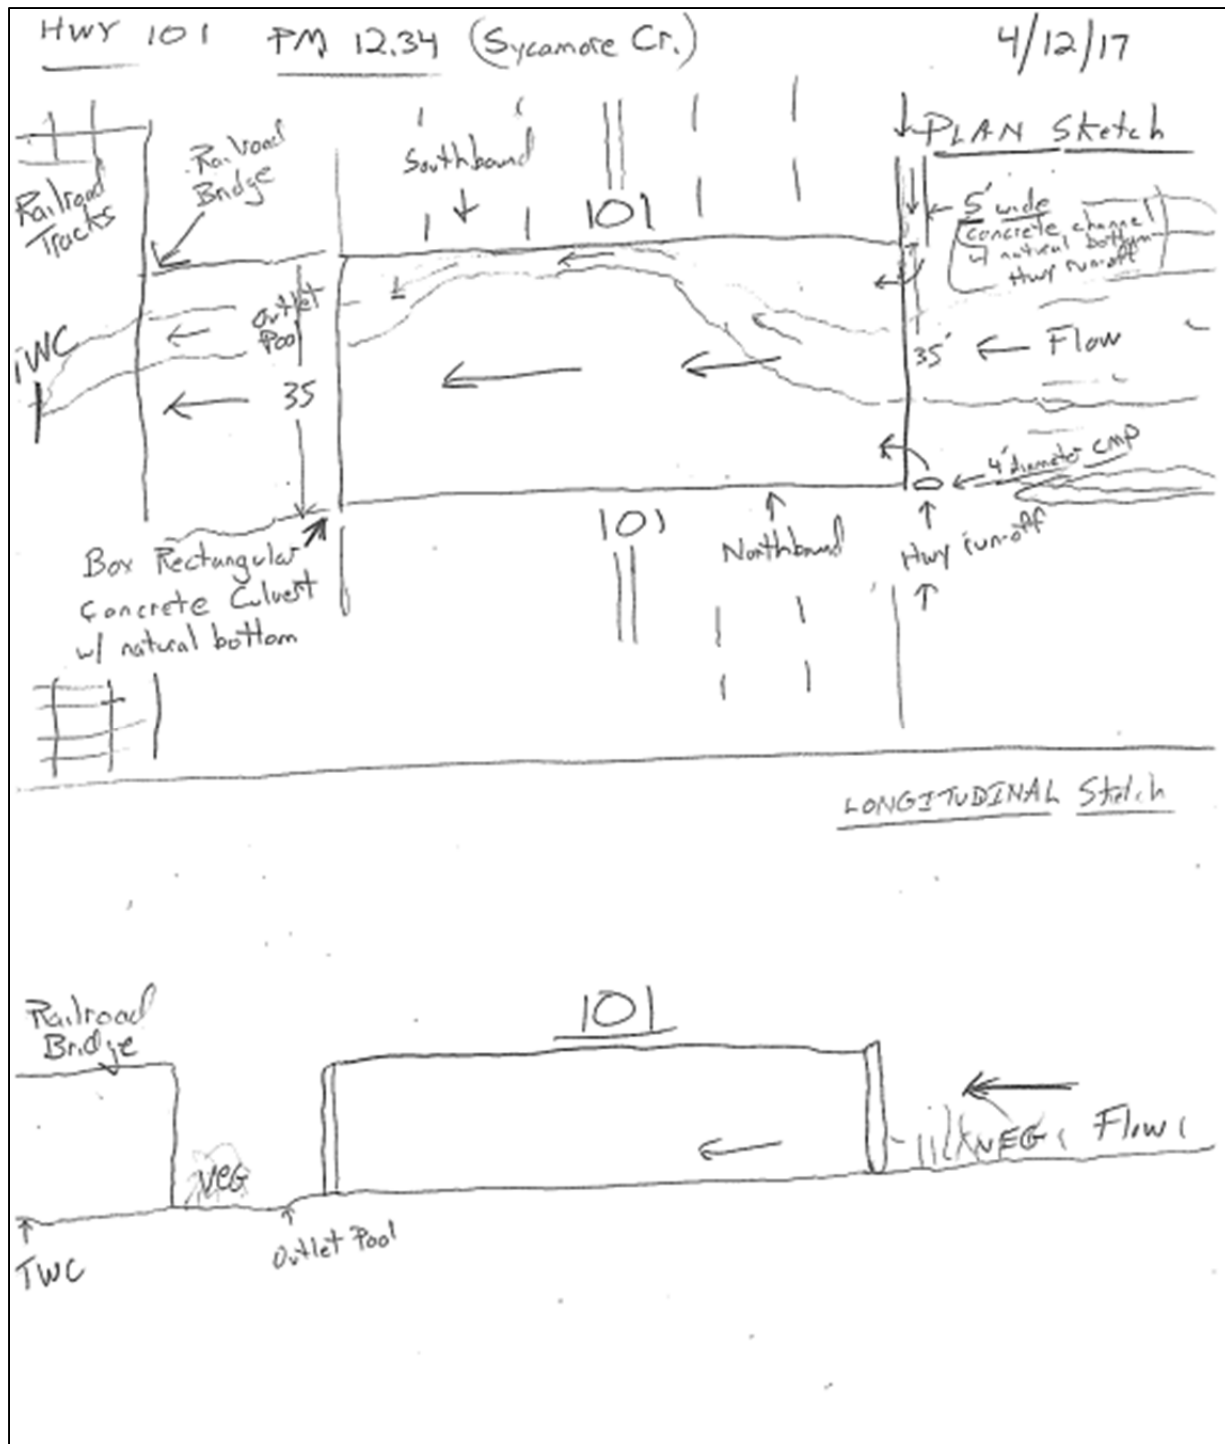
Site sketch for Santa Barbara County, Route 101, PM 12.34.
